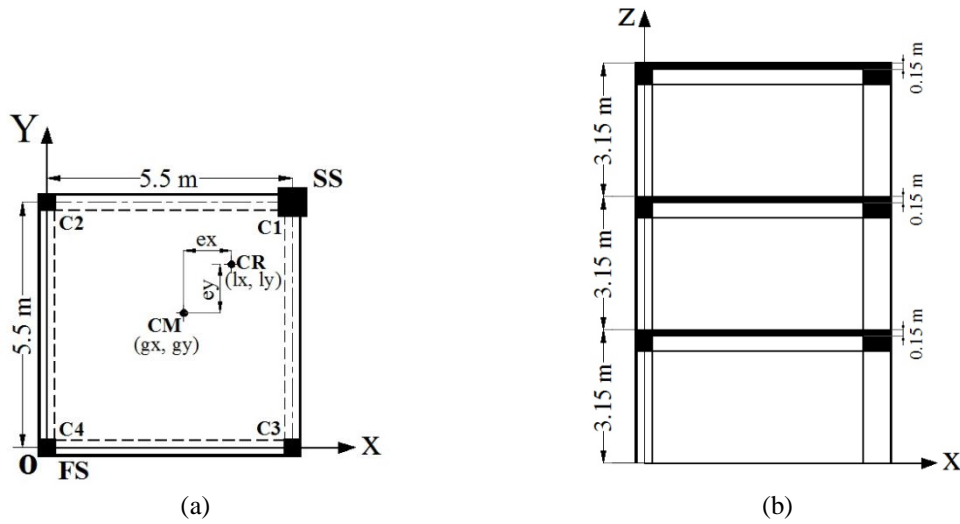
One-bay three-storey RC P-structure (a) plan and (b) elevation.
